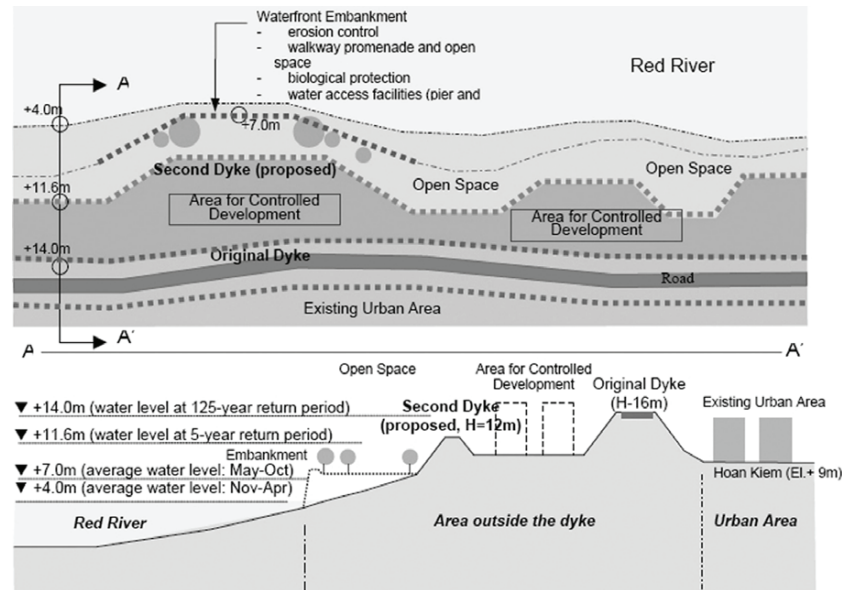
Detail plan and section of Japanese proposal for the Riverside Areas in Hanoi .
